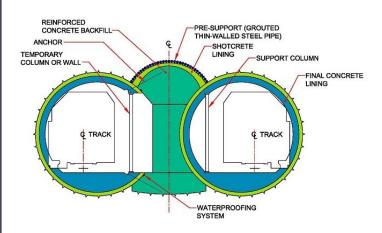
Modification of the middle pillar for the new underground subway tunnel and Airport Express terminal station.
